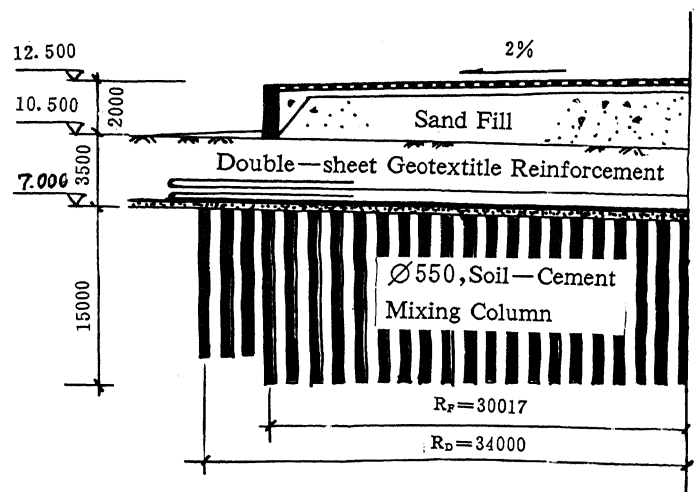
Cross-section of Improvement of Sub-soil by Deep Mixing Technique for 50000 M³ petroleum storage Tank.
